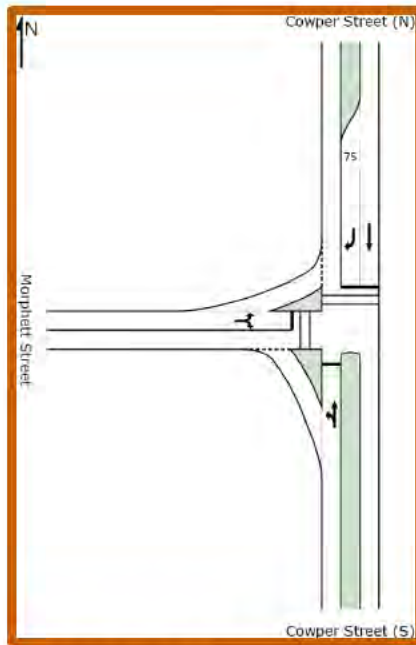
Recommended Layout for the Intersection of Morphett Street and Cowper Street
